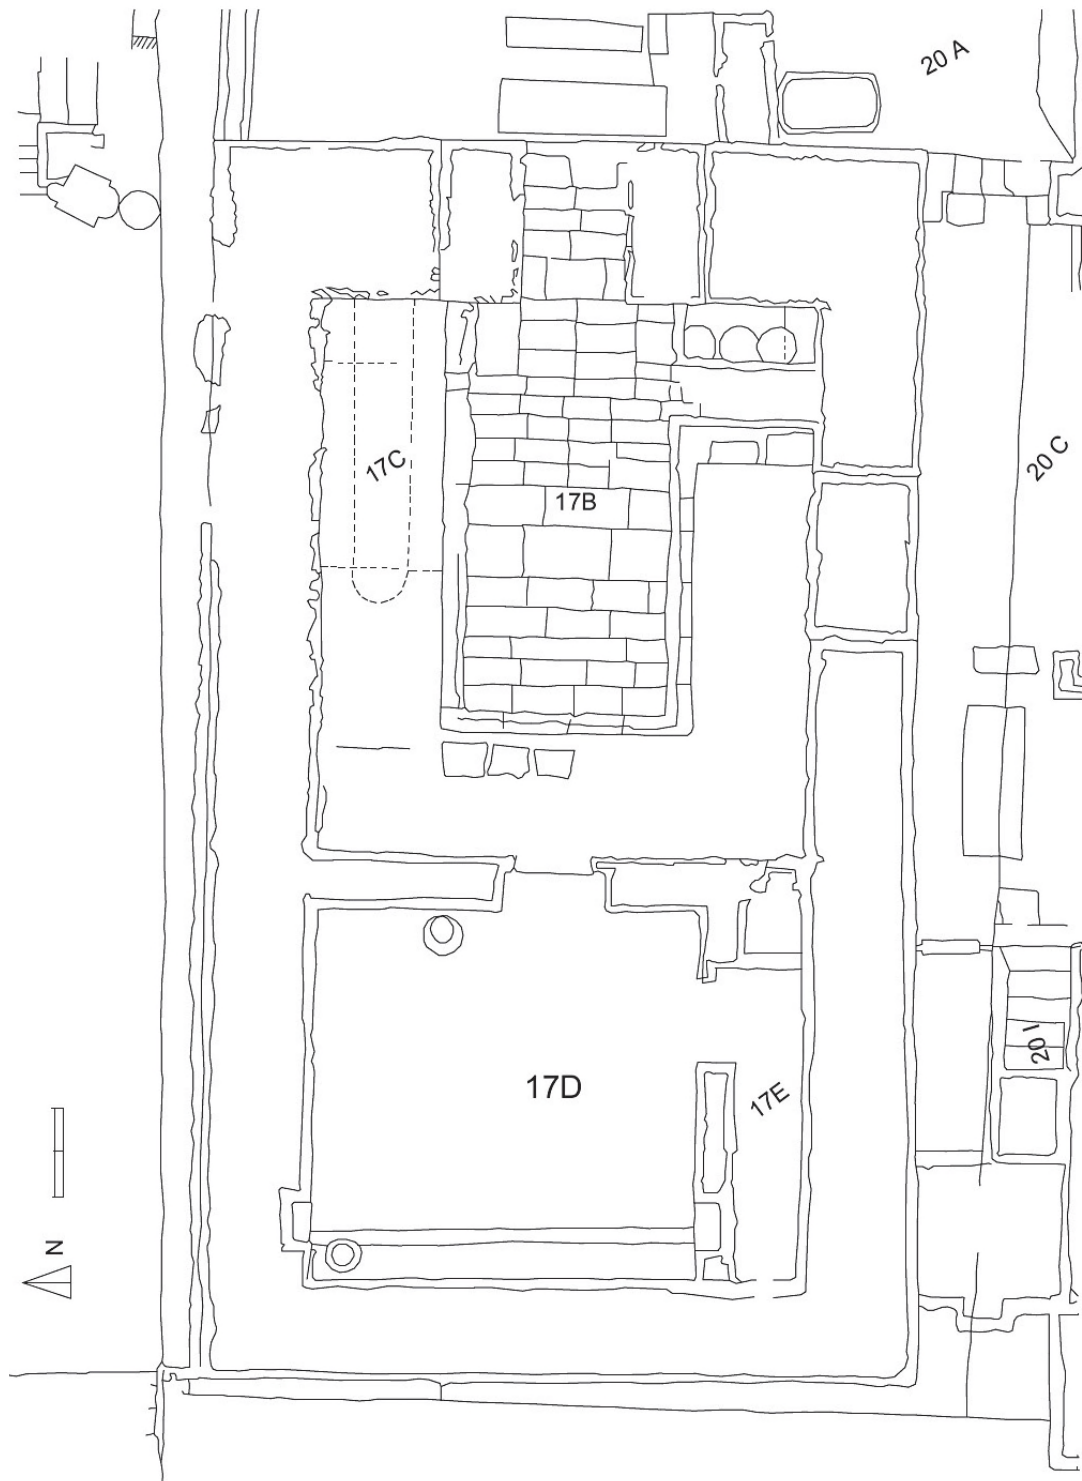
Detail of building 17 on the general plan in Fig. 1. Tracing by G. Deotto, courtesy of MSA.
